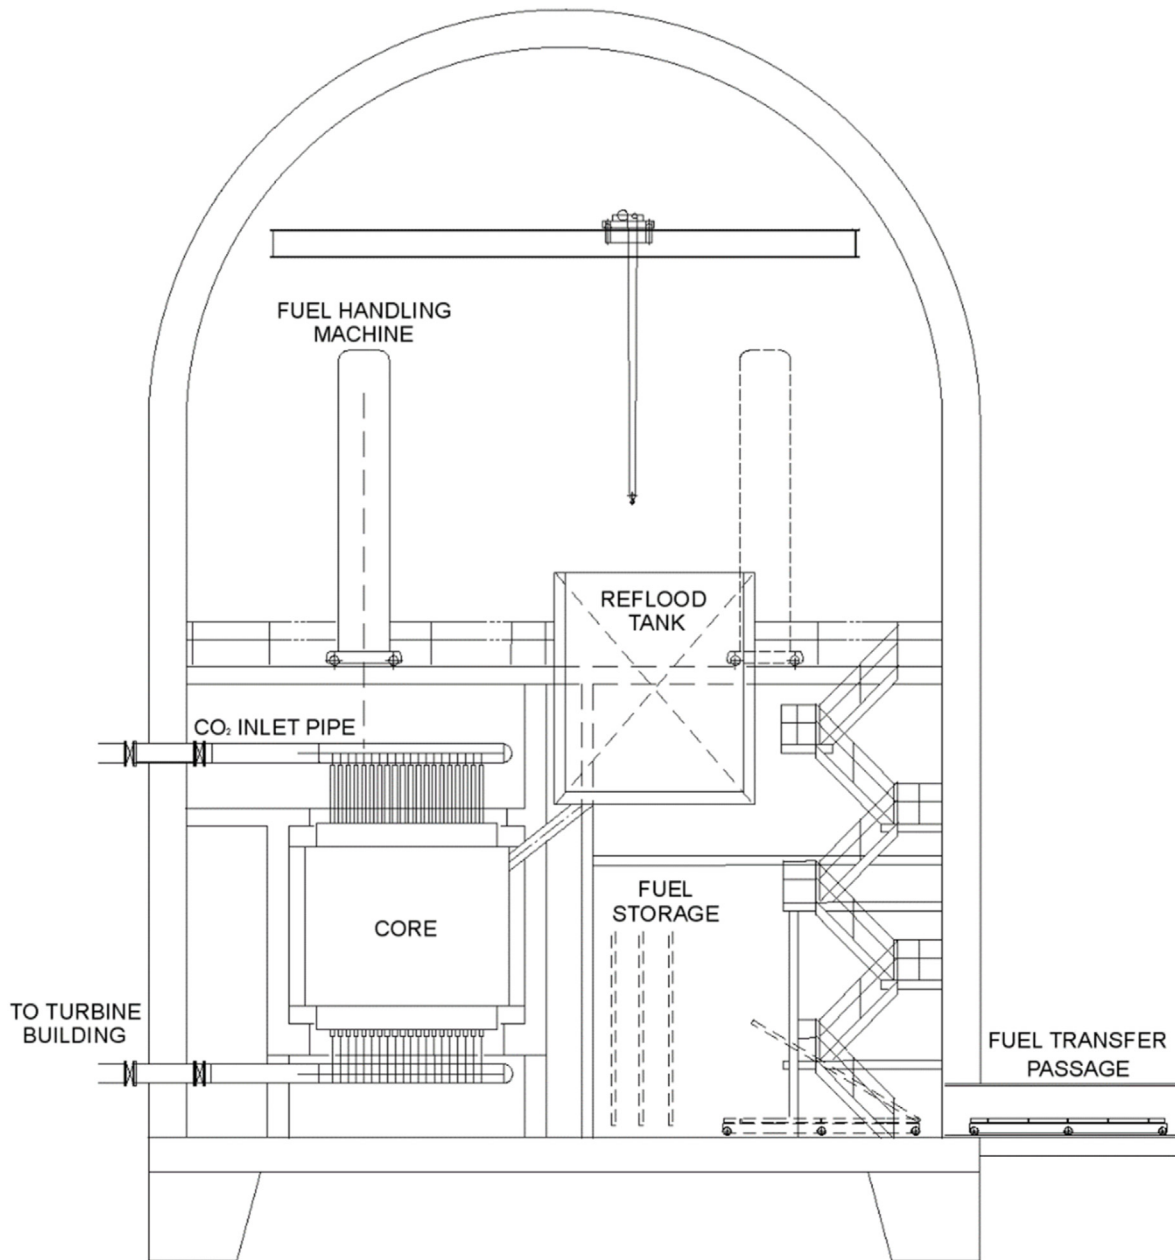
General arrangement drawing of a HWGTR reactor building.
